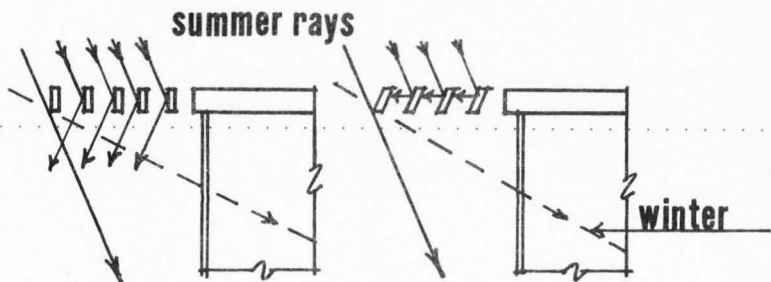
b. Louvered overhang: eliminates direct rays of the sun. Spacing of louvers and projection of overhang should be calculated if louvers are fixed. Permits free air movement and entry of diffused light.
